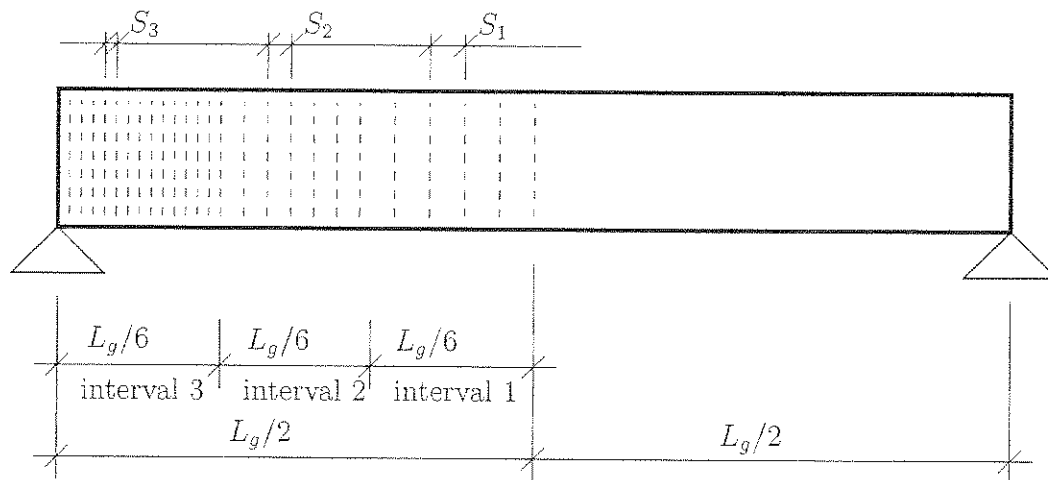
Reinforced concrete girder with shear reinforcement.
